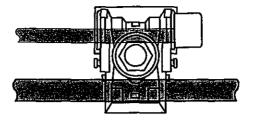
13 Joining conductors with a V-shaped connector
